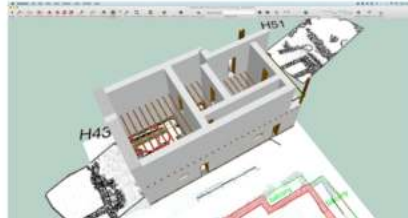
Walls, wooden features to support first floor, doors and balcony are created.
